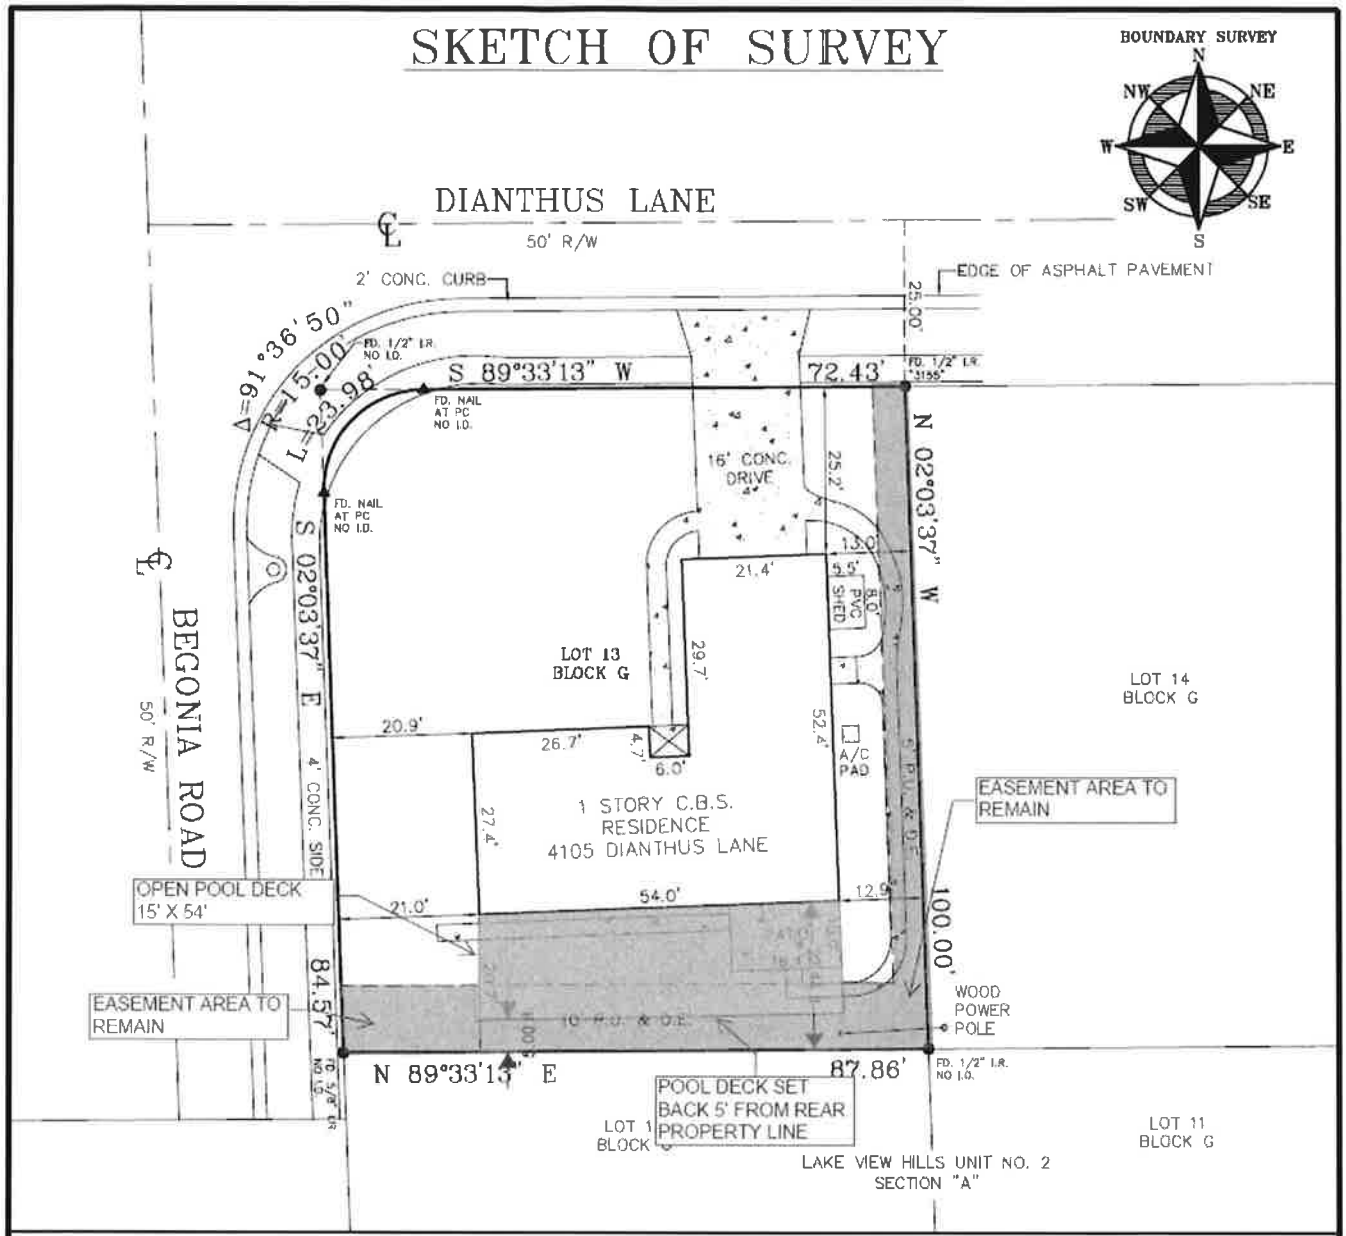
Copy of proposed pool plan area 15 feet by 54 feet open pool deck with a 5-foot set back from property line (highlighted in blue).
